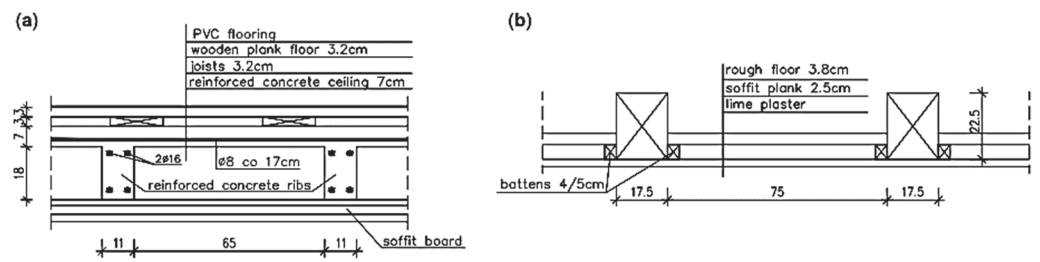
Ceiling sections: (a) concrete ceiling above the ground floor and (b) wooden ceiling above the first floor.
